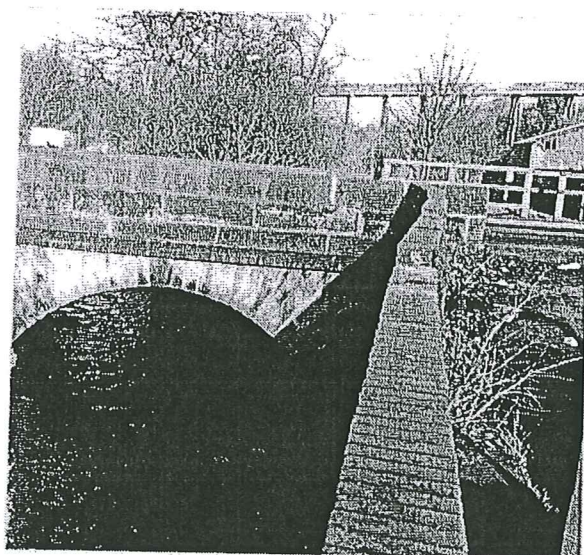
RAWFOLDS BRIDGE AND ST. PEGS BRIDGE
